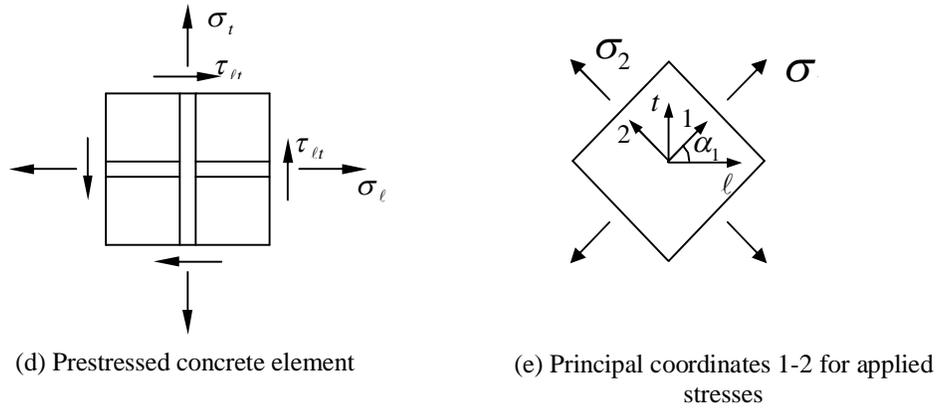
Coordinate System in a Prestressed Concrete Membrane Element
